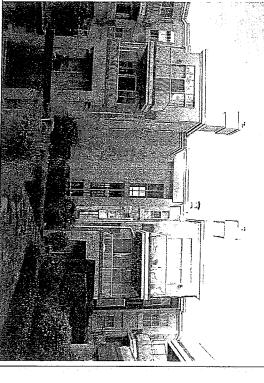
Partial overview of Highbury Street, West elevation. Note work in progress at balconies and units 216/217.
